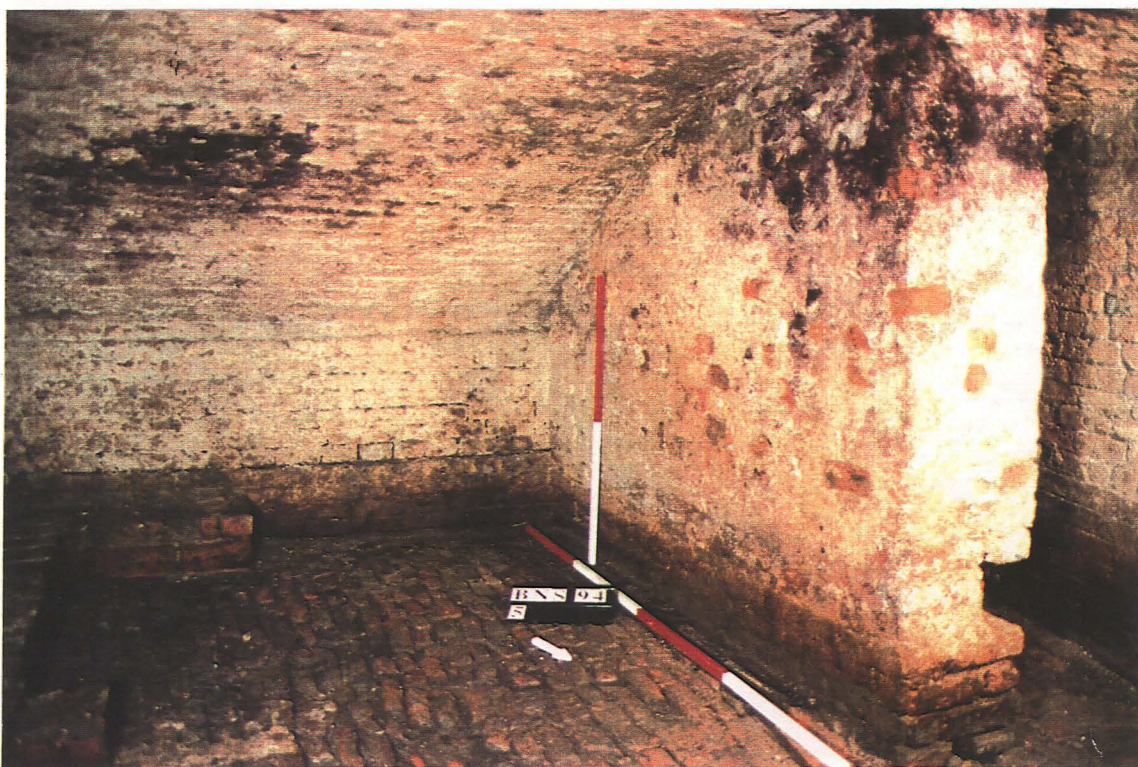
Looking south-west at cross-wall [5], with brick floor [19] in foreground and raised feature [3] on left side of frame
